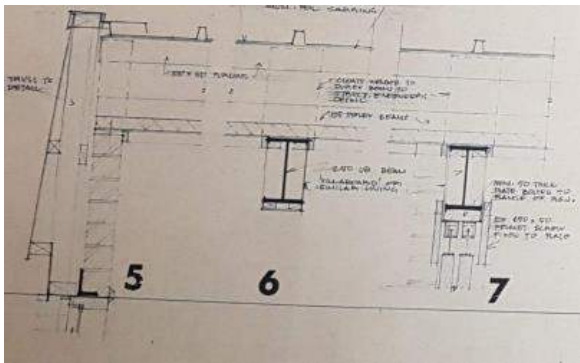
Existing architectural drawing showing detail of roof structure.
